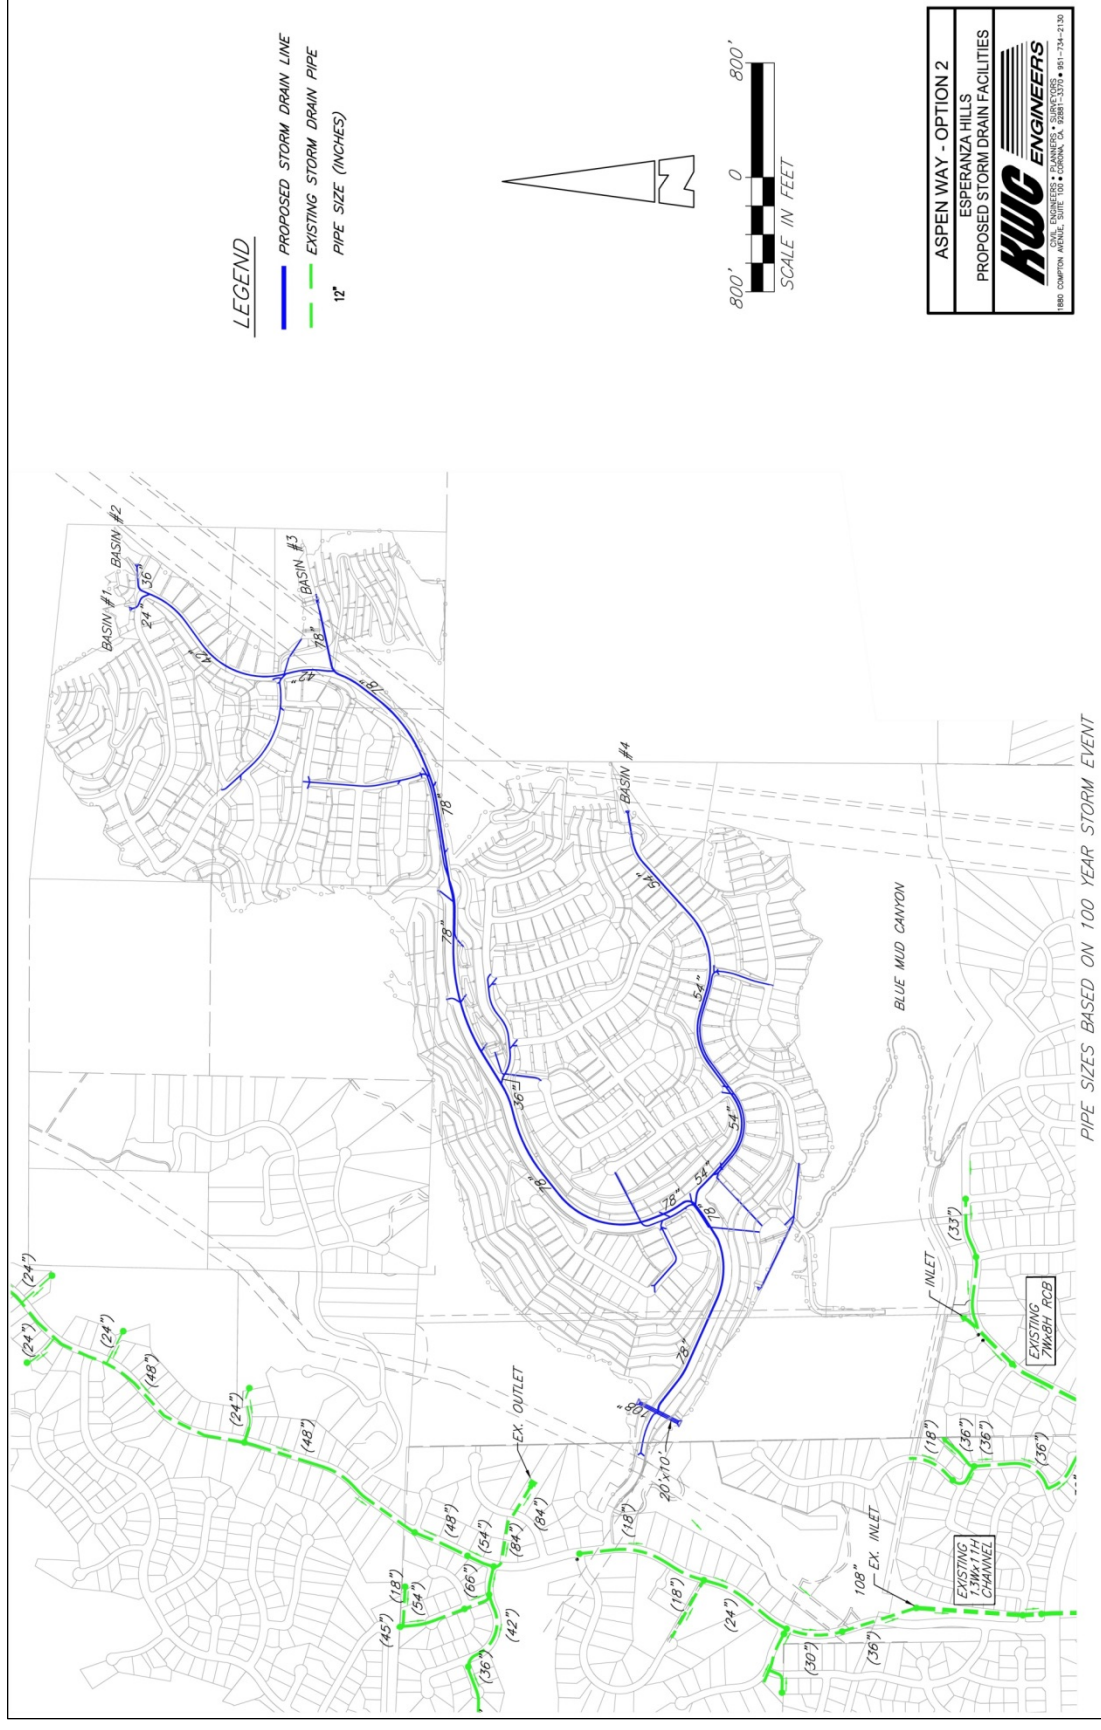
Proposed Storm Drain Facilities Plan, Option 2A
